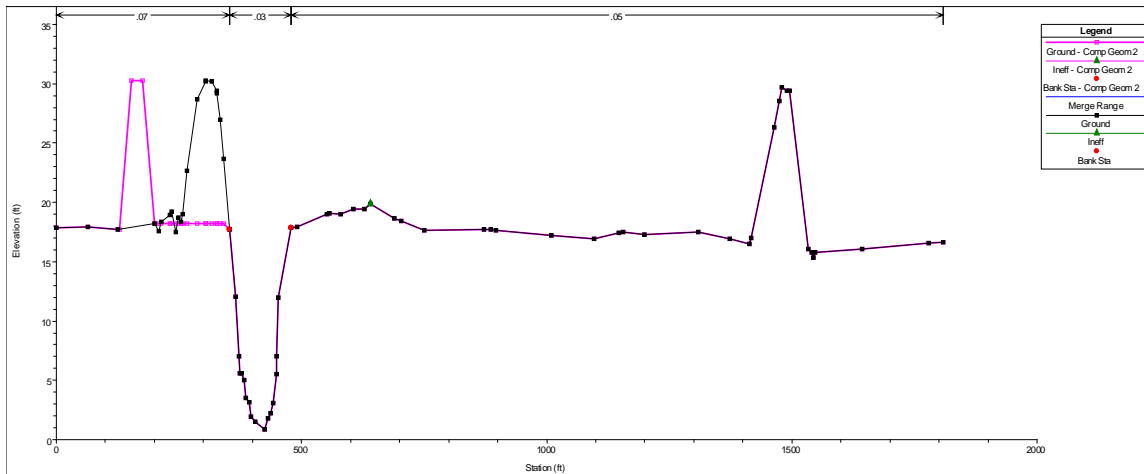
New Design for UPRR #1 Cross section 6.8925
